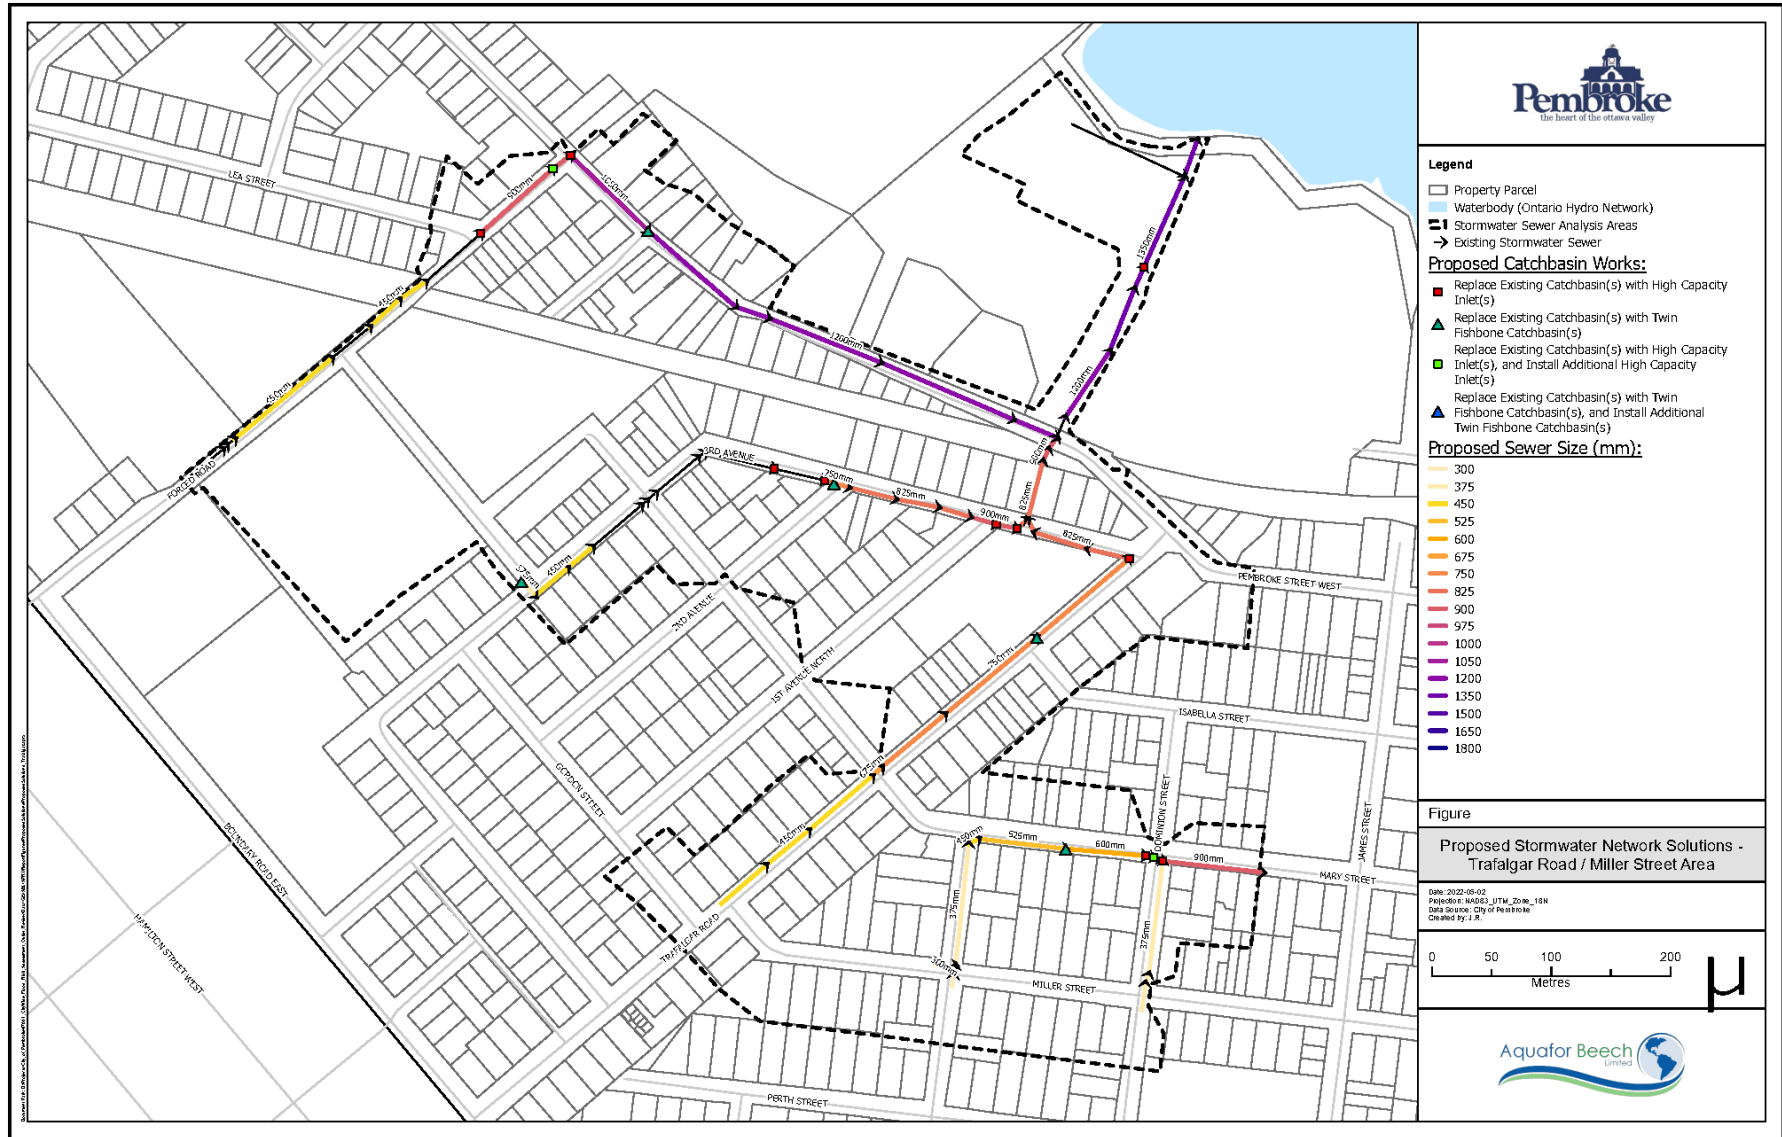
Proposed Stormwater Network Solutions of Trafalgar Area
